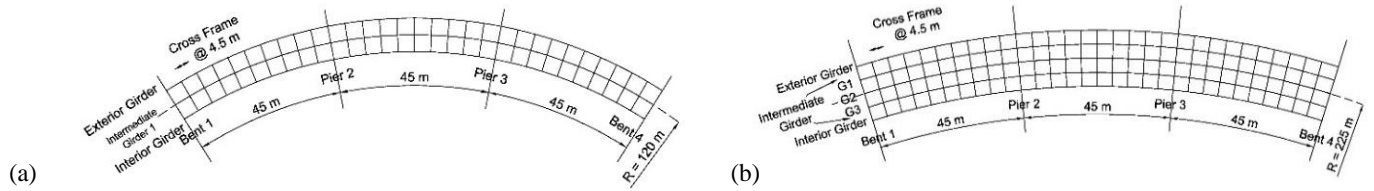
Models in a plan view: (a) plan view of CB1; (b) plan view of CB2
